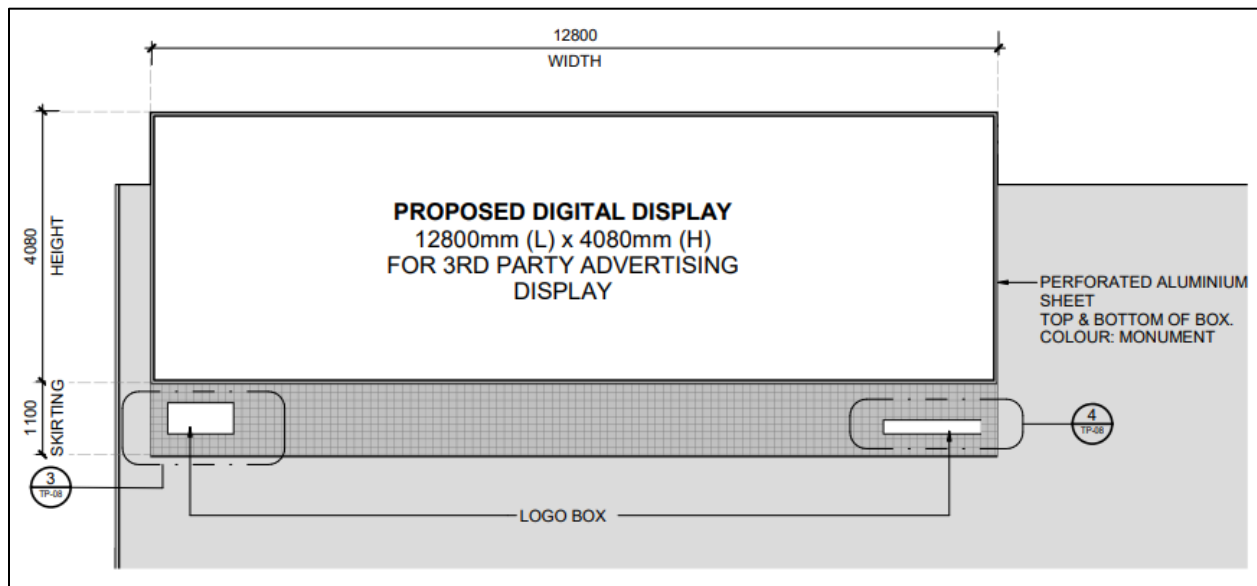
Extract of plans - Primary elevation (sheet TP-08)
